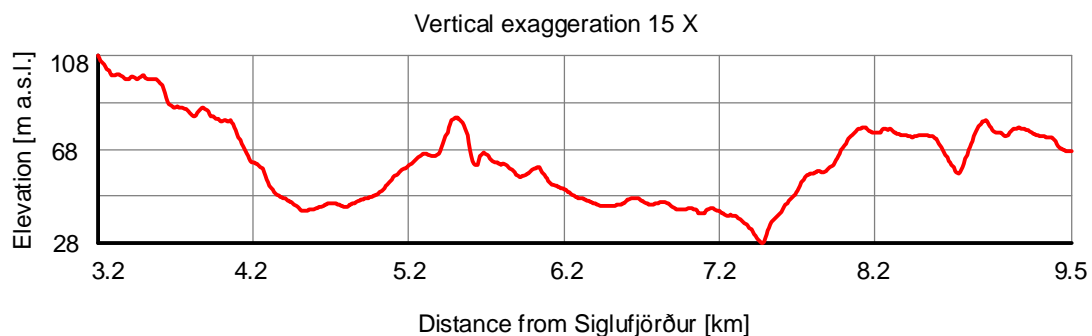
Vertical section of road section 912: km 3.2-9.5 – northernmost point of road no 76 to Skriðnavík
